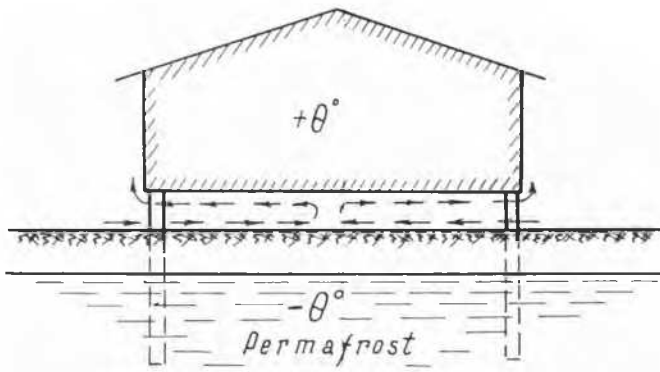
Schematic drawing of building with basement ventilated in winter.
